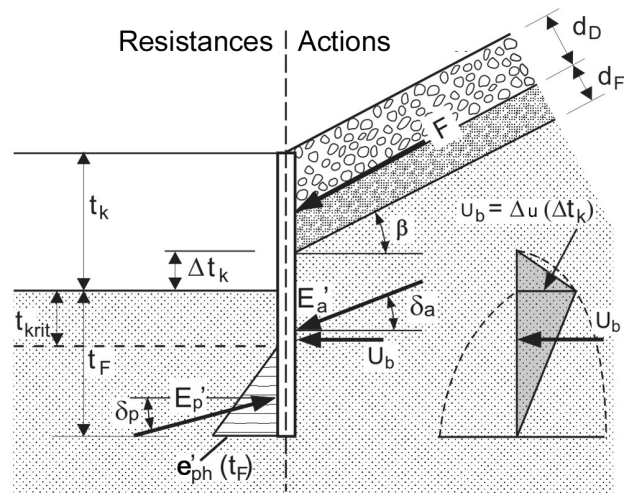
Toe support in the form of a sheet pile wall for a slope revetment (failure mechanism 2).
